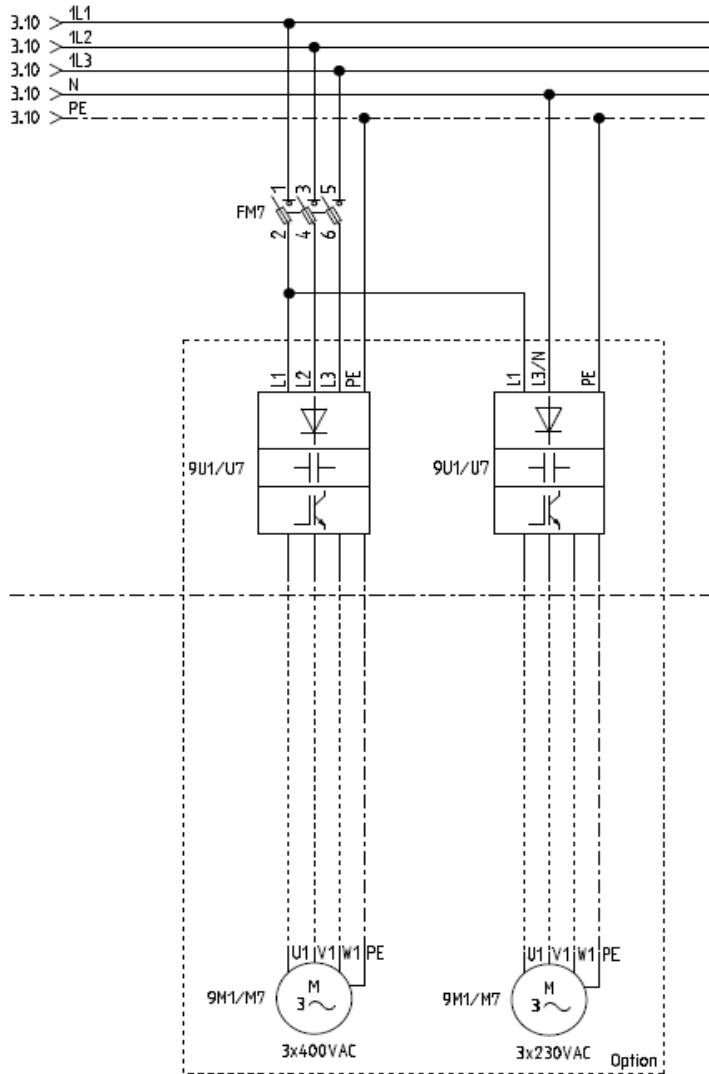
C Power supply diagram for S/E air handling units - eight fans 3-15kW (outdoor design with inverters inside)
